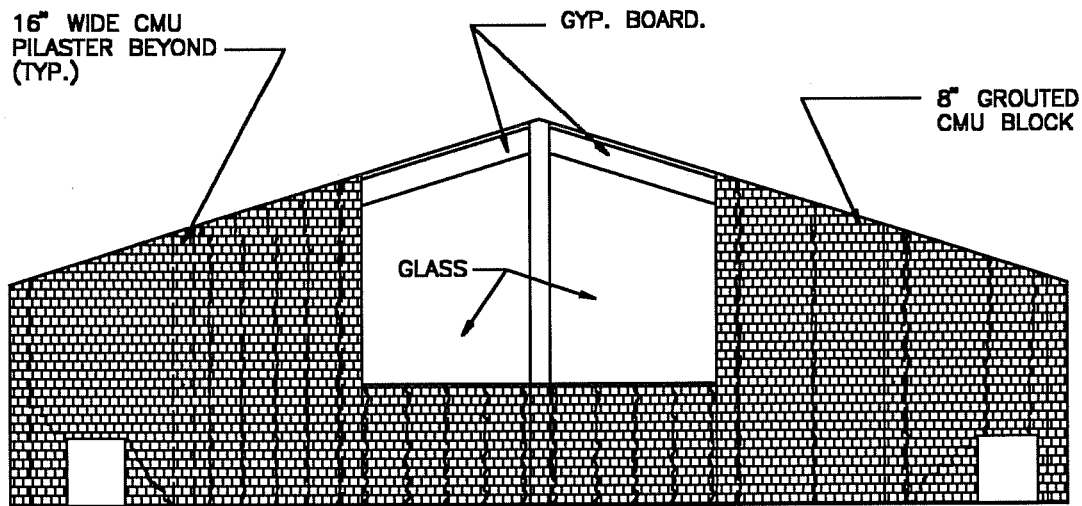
Loma Prieta Community Center - Observed cracks in north gymnasium wall
